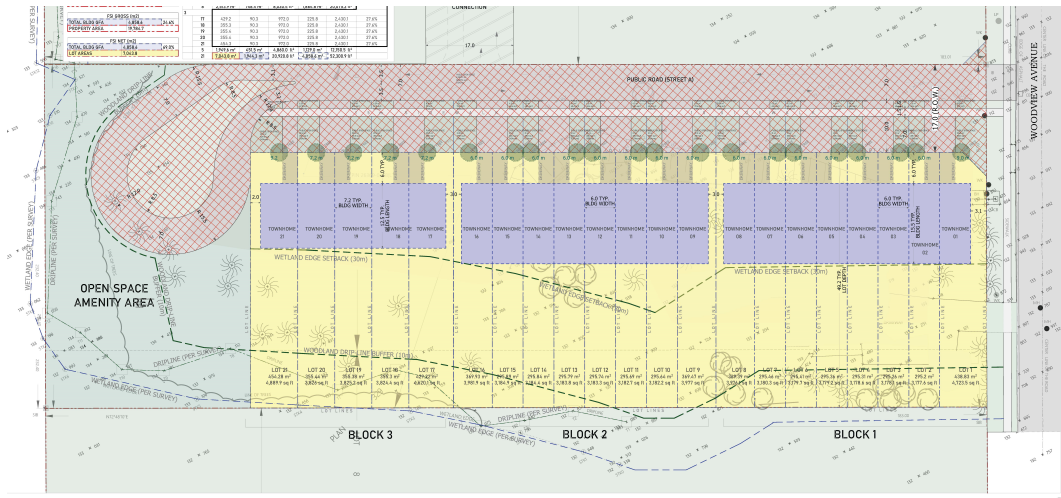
General layout of the 1942 Woodview Avenue development trees are numbered (green) and tree protection barriers (red) are indicated. See Figure T#1: full-scale Tree Protection Plan (TPP) and Site Plan Proposal (Planning Version Ei: 2022-07-20) for more details.
